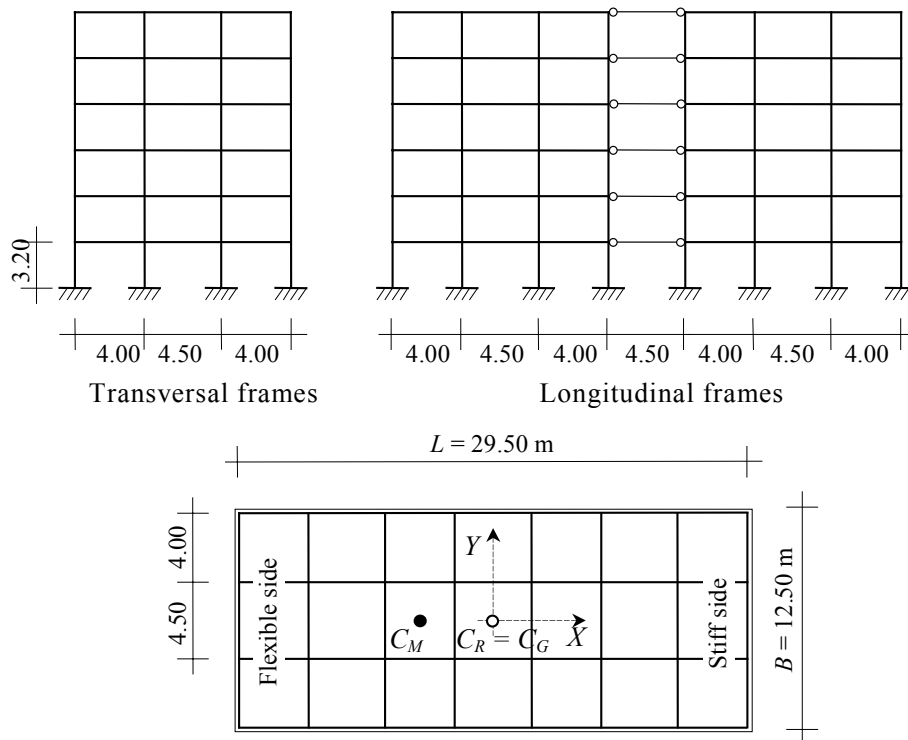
Plan arrangement of the multi-storey building and scheme of the frames.
